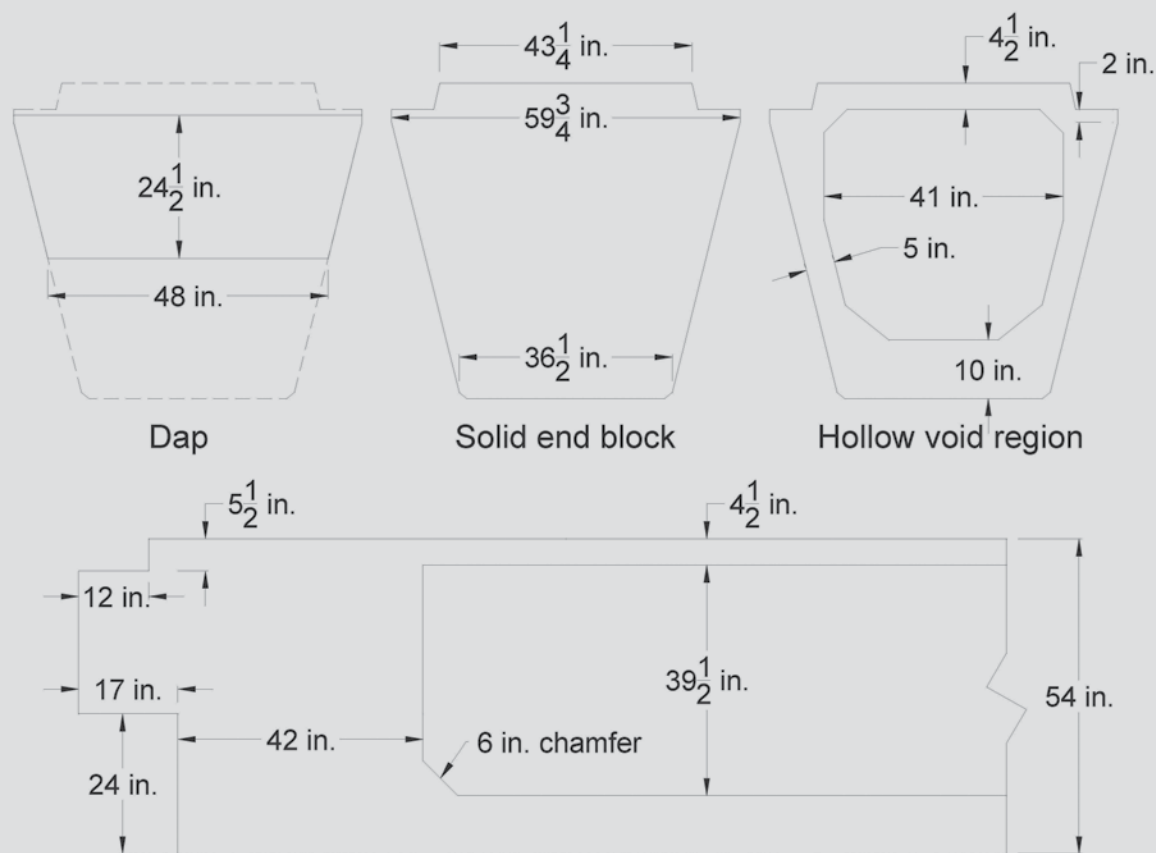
Dapped-end dimensions of the trapezoidal box beams. Note: 1 in. = 25.4 mm.
